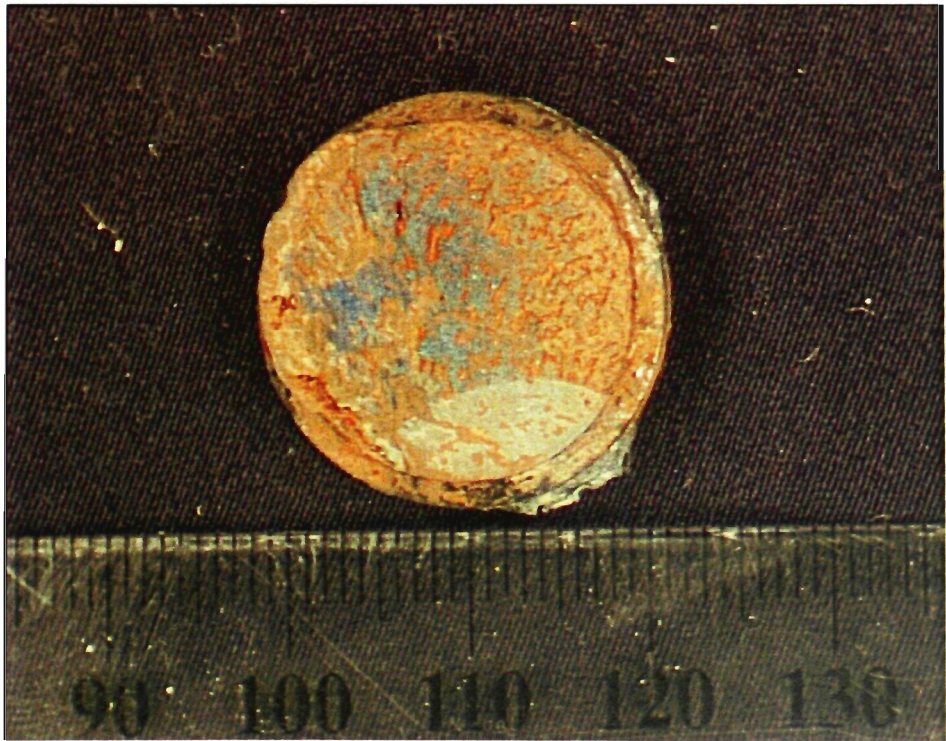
Rock bolt fracture surface overview
